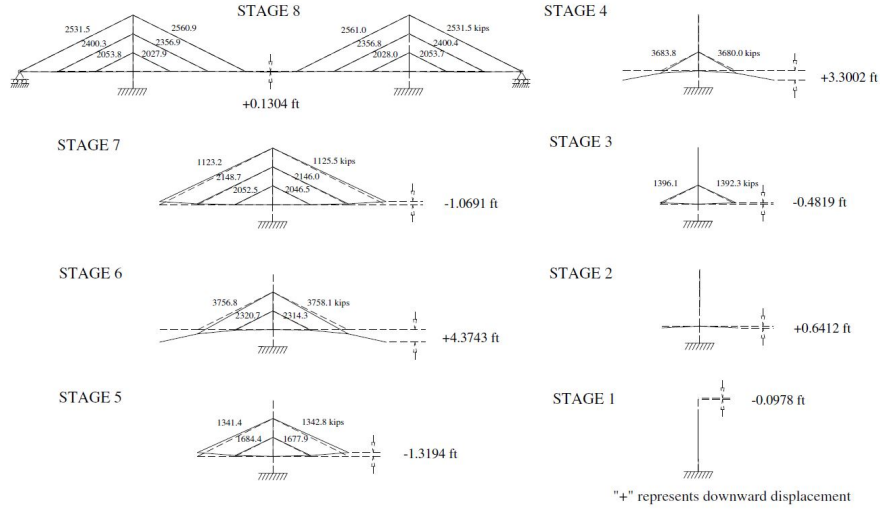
Backward approach for double cantilever method proposed by Wang et al. [5].
